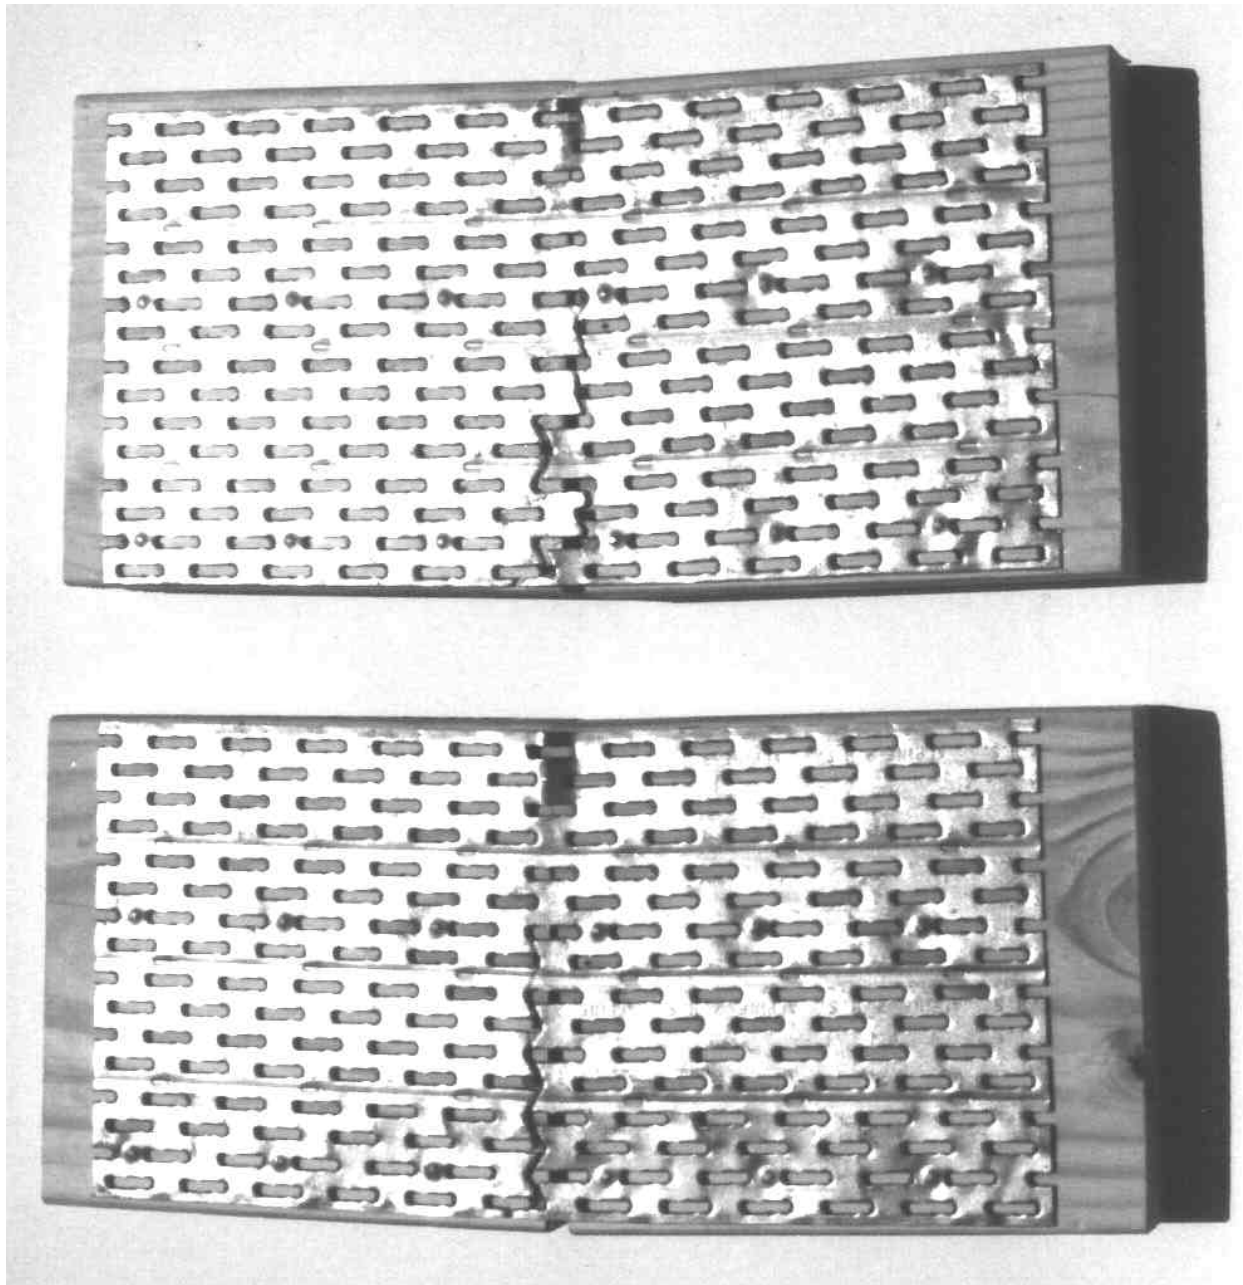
Typical failures for the 2x6 joints with 20-gauge plates tested in combined tension and bending loading.
